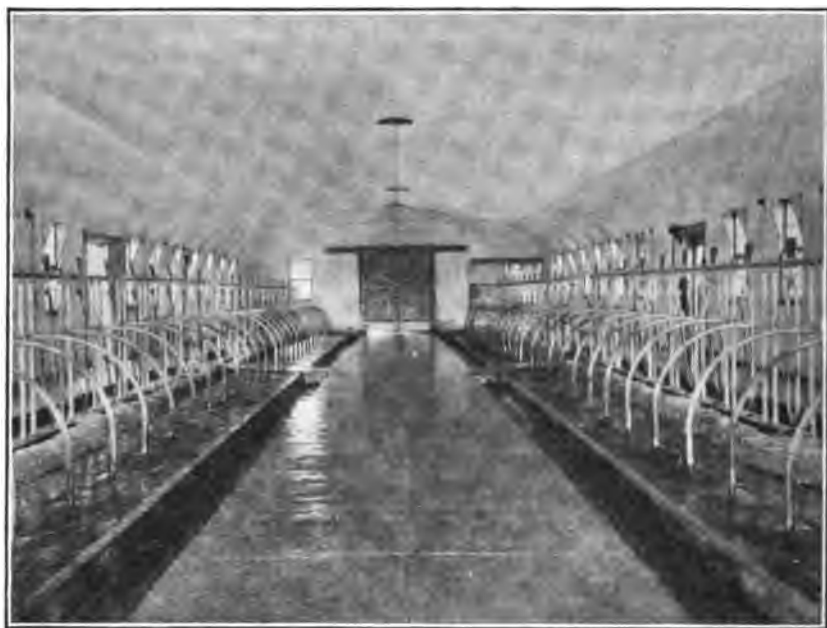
Interior of the dairy stable on the farm of the U. S. Naval Academy. The construction is such as to minimize the labor necessary to keep floor, walls, ceiling, and stable fittings in a clean and sanitary condition.
